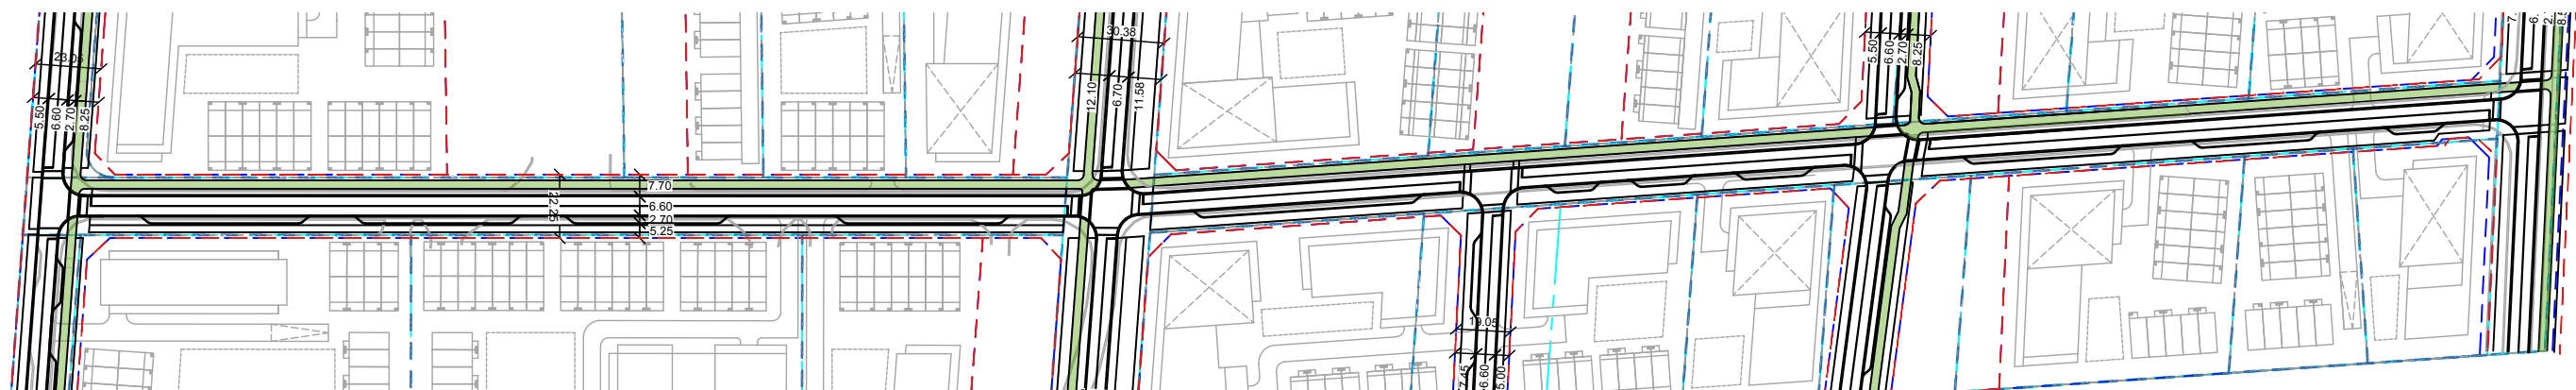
RANGEVIEW ROAD - FUNCTIONAL PLAN & CROSS-SECTIONS
